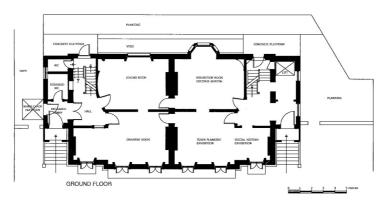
The Decimus Burton Museum - proposed ground floor plan. Copyright Paul Avis
